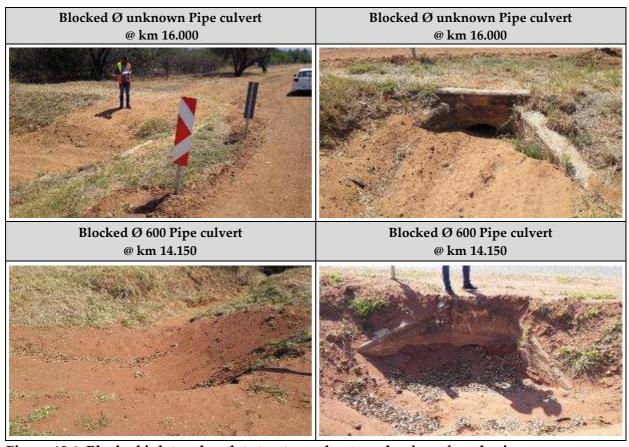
Blocked inlet and outlet structures due to reshaping of road prism
